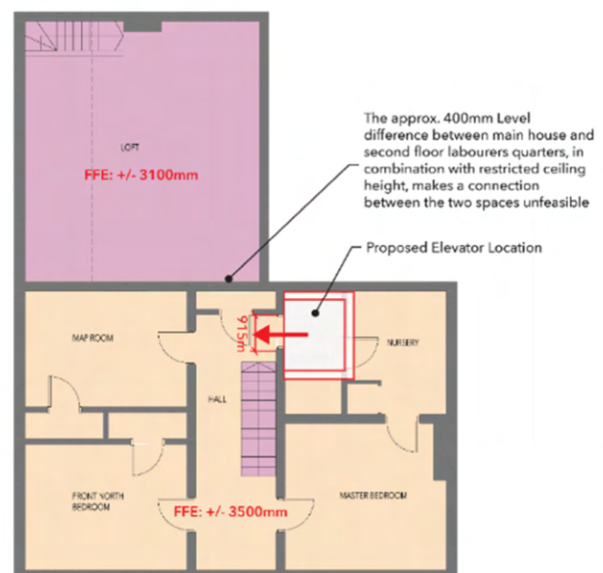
Main House - Second Floor Proposed Accessibility (Option 1)
